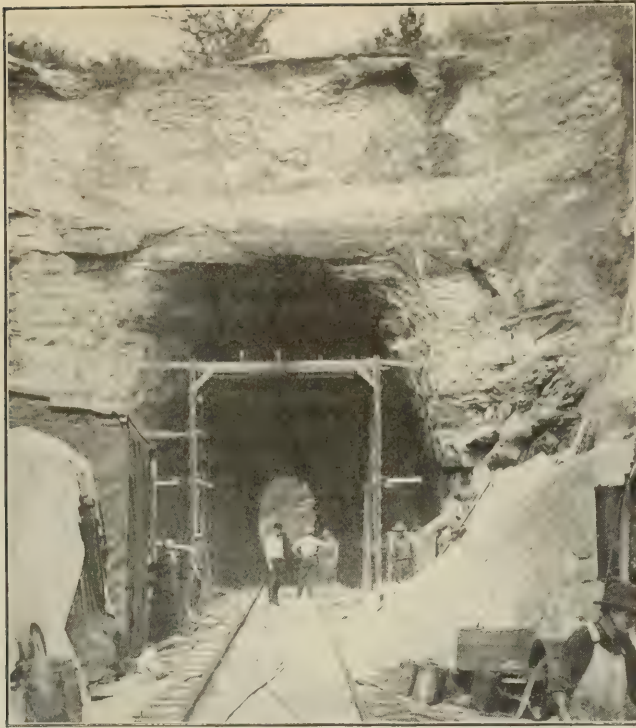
ERODED ROCK TUNNEL WITH EQUIPMENT IN PLACE FOR LINING
